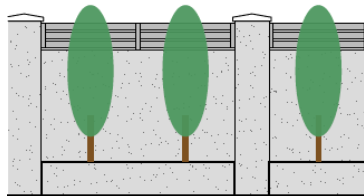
Non-permeable fencing – rendered masonry wall to 1600mm with permeable infill panel above
